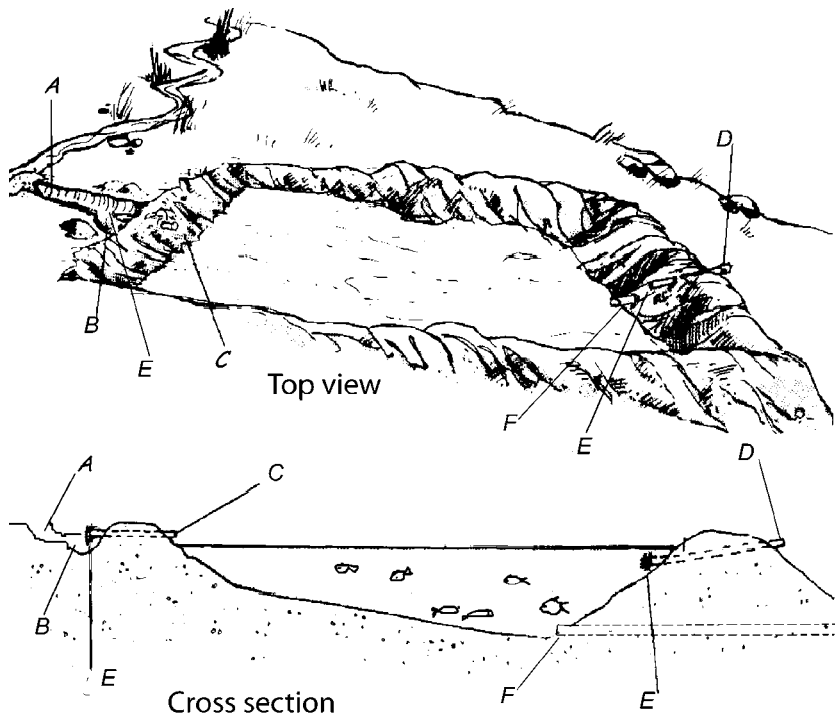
The water inlet and outlet of a pond (Murnyak, 1990). A: inlet canal; B: silt catchment basin; C: inlet pipe; D: overflow pipe; E: screen, F: outlet pipe. (Top view and Cross-section)
